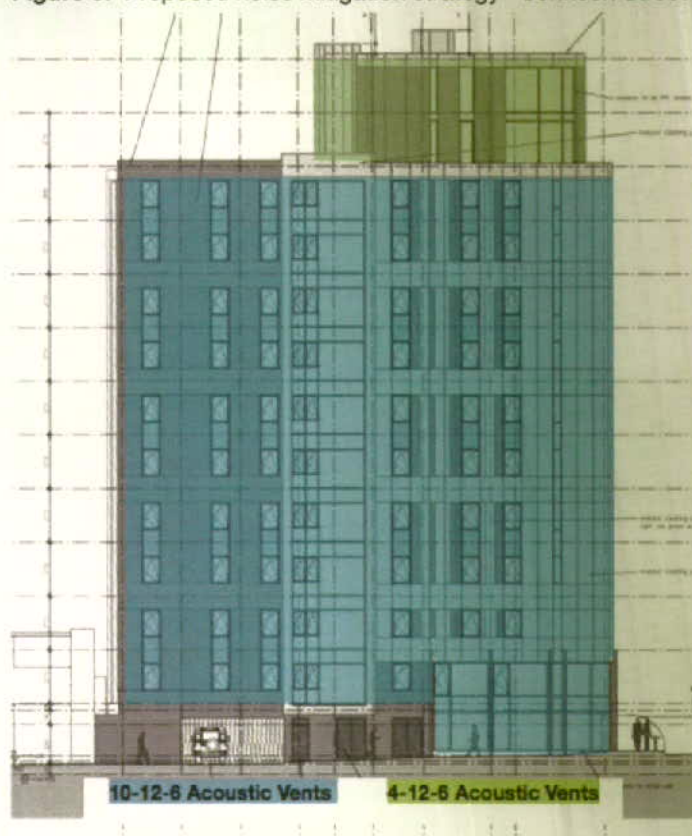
Proposed noise mitigation strategy - Johnson Street ElevationFigure 4: Proposed noise mitigation strategy - Hatton Gardens Elevation
